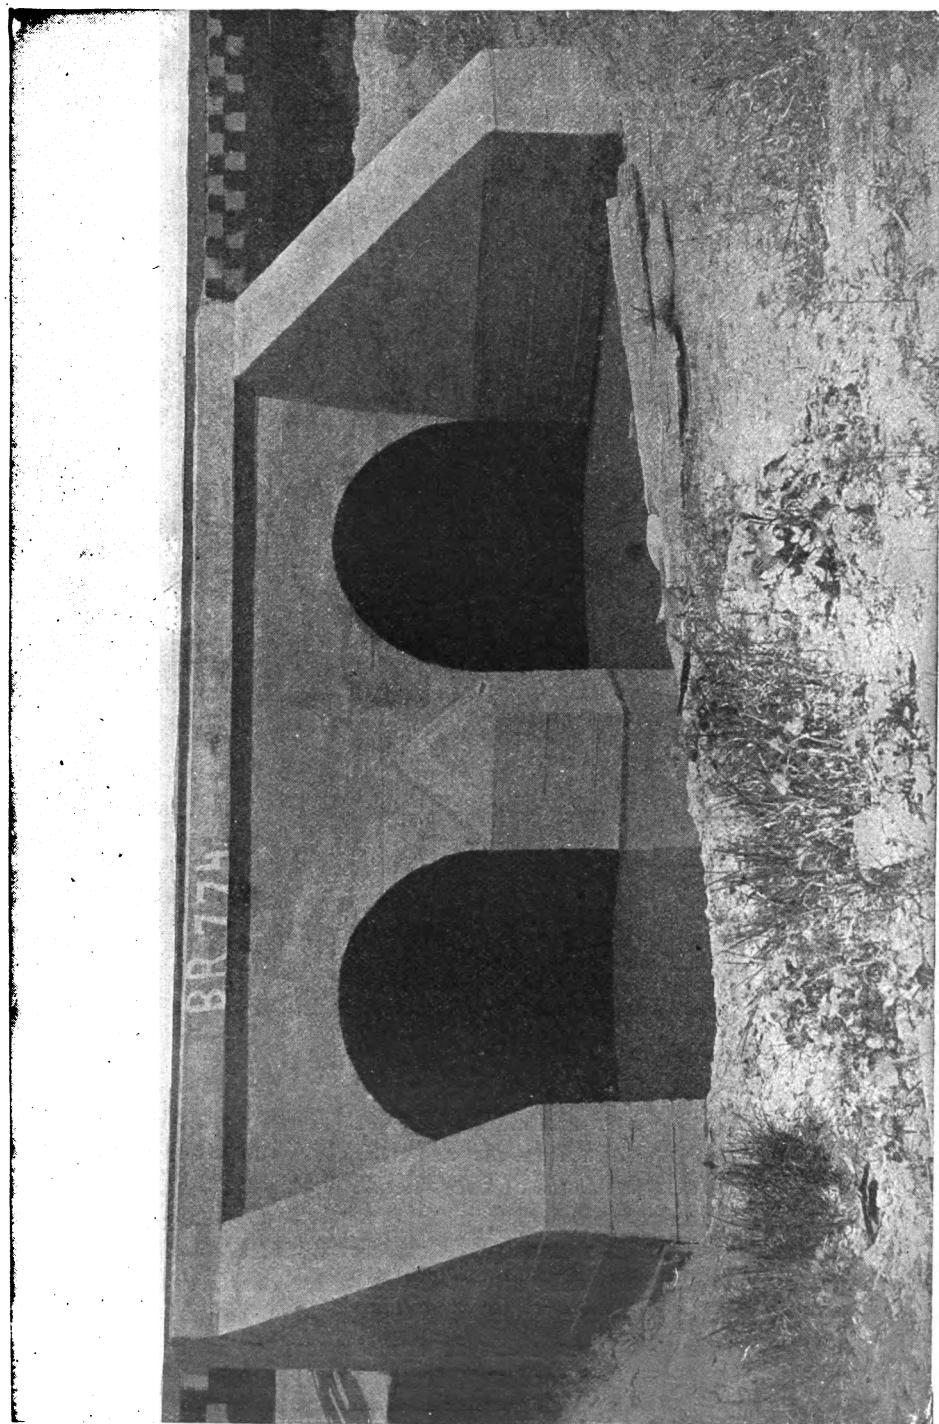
Double Six-Foot Culverts, Rankin, Ill.
